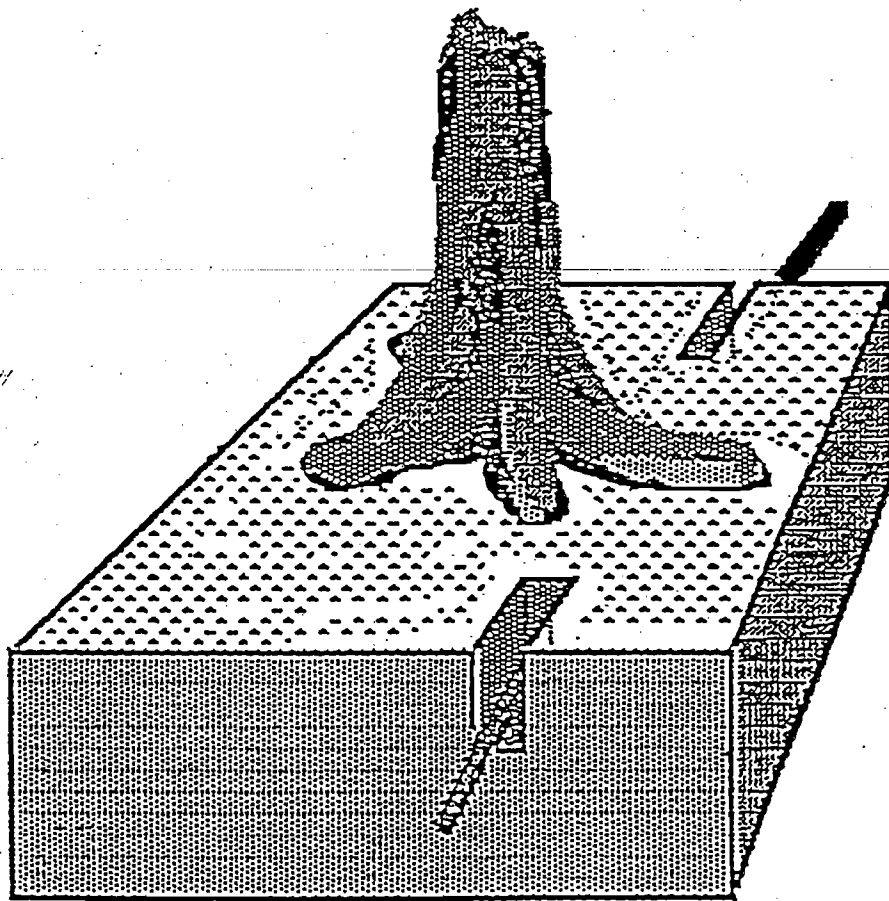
TUNNELING FOR UNDERGROUND UTILITIES
